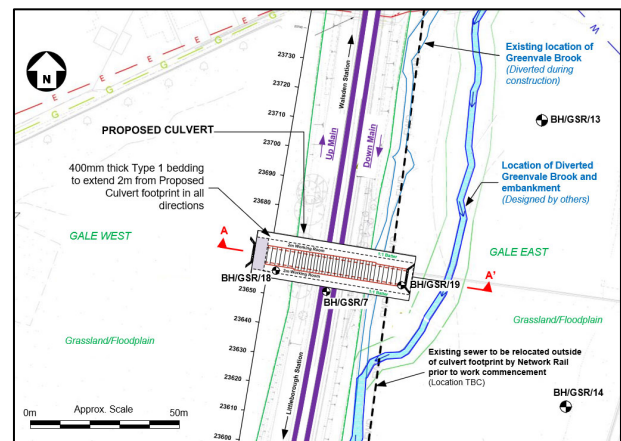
Site plan showing location of the box culvert in relation to the Network Rail Calder Valley Railway Line and Greenvale Brook.
